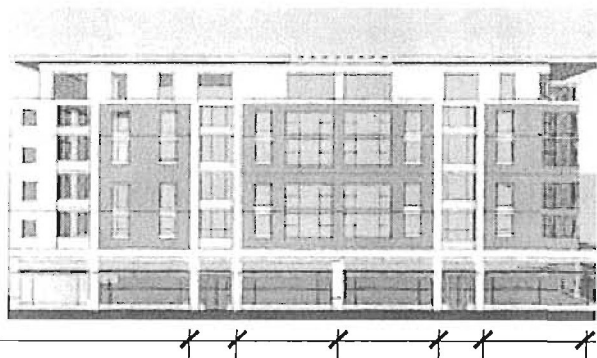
d.1 & 3 belt line above ground level and regular cadence of bays and storefronts framed by pilasters
